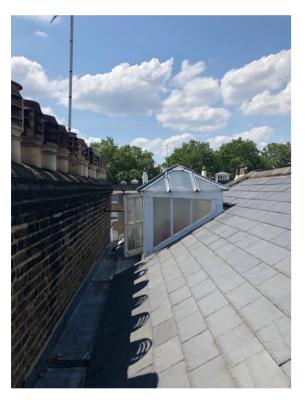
The existing singleglazed roof lantern as viewed from the east. It provides light to the stairwell below, whilst also serving as a means of access for both the roof and the loft.
